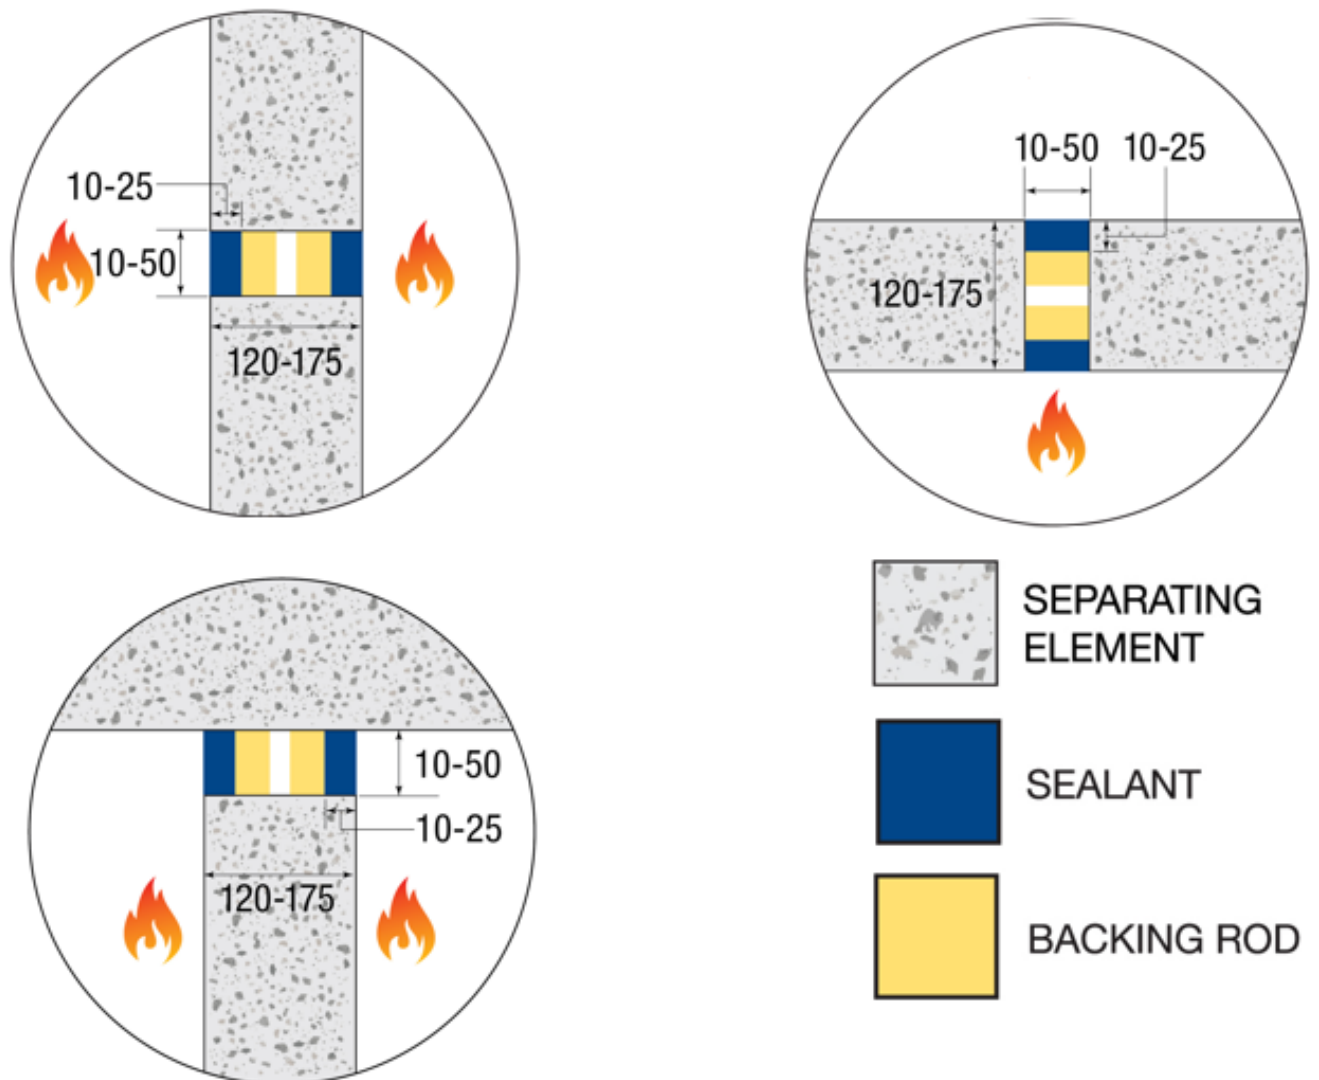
Client Supplied Drawing - Double Caulked Control Joints
